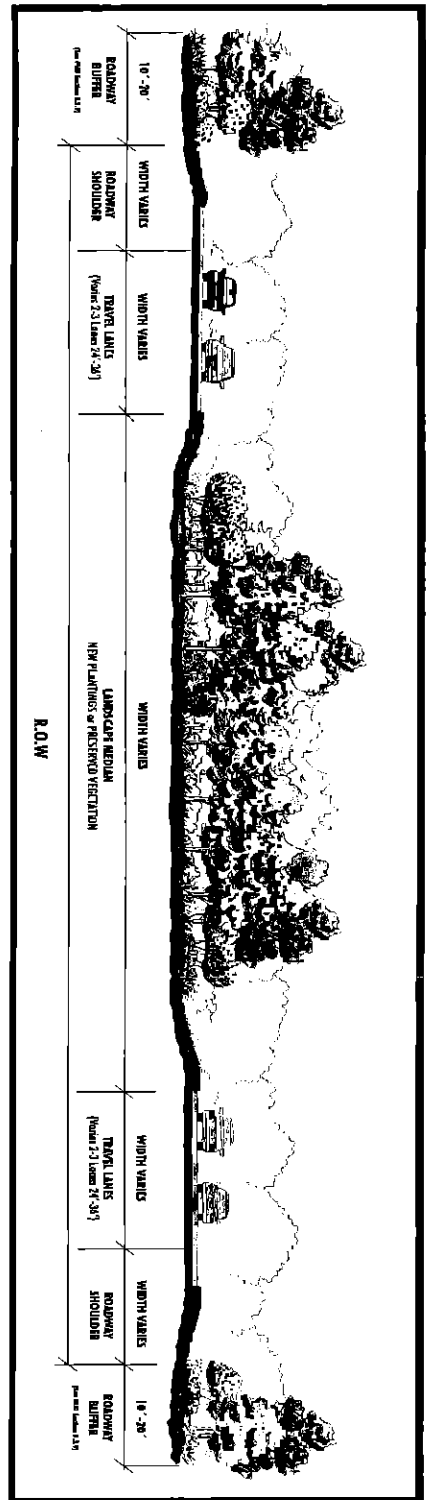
NEW CR 210 (US 1 to COUNTY LINE) TYPICAL SECTION
